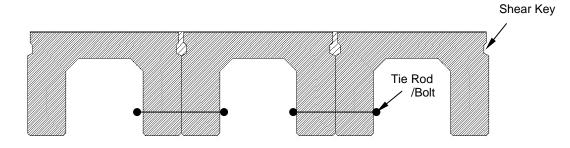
B(2) - TYPICAL CROSS SECTION OF INVERTED U-BEAMS
